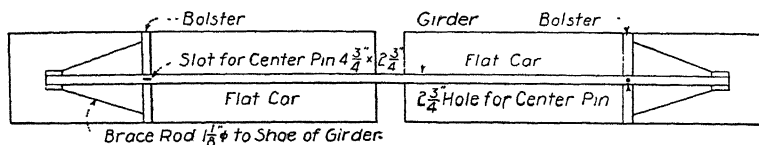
Plan showing end bracing of girder, and pivot pins.
